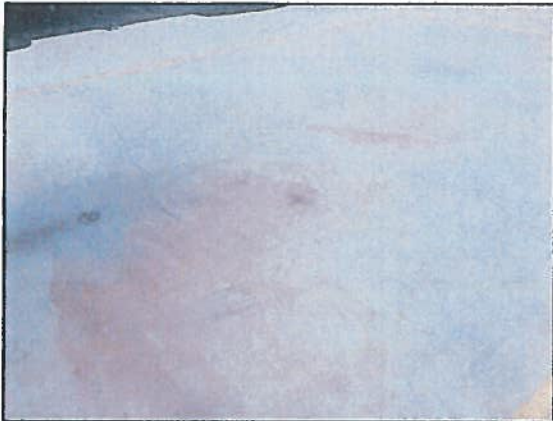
Maintenance Facility – Thin cracks and some staining on back concrete driveway
